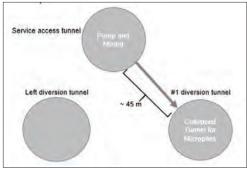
Cross-section of the twin tunnels and the service tunnel where they would mix /pump the underwater grout into Diversion Tunnel 1
